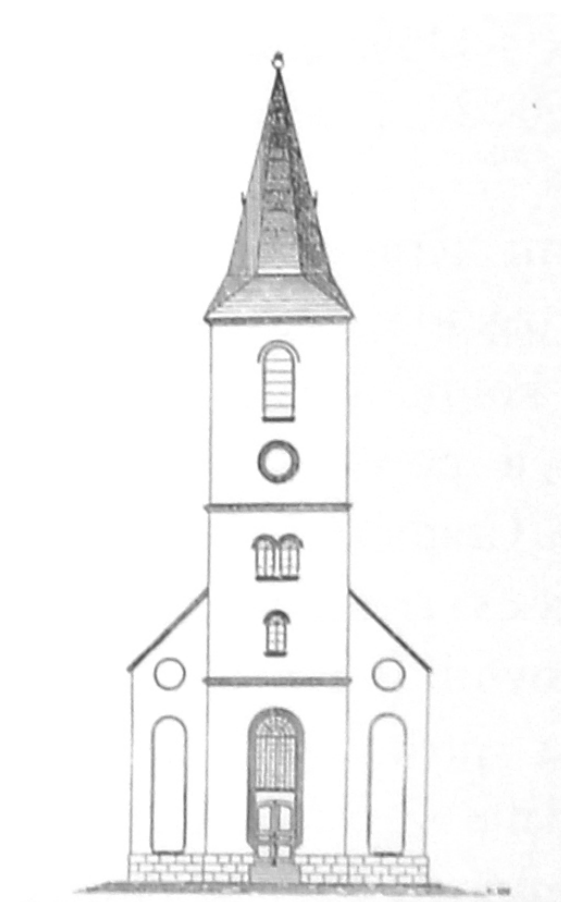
Banja Luka parish church devoted to Quest of Blessed Virgin Mary to saint Elisabeth; elevation view from north
